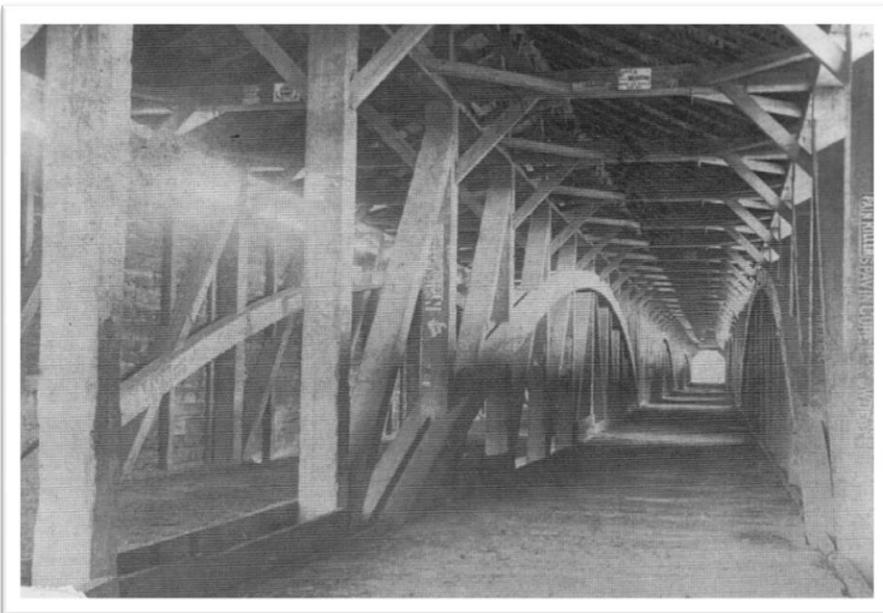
View inside the Fish House covered bridge with 12 timber arches
